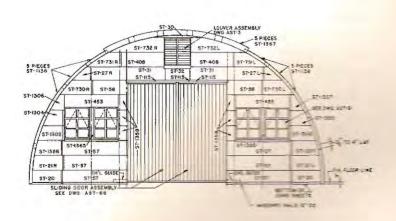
DETAIL SHOWING BULKHEAD CORRUGATED SHEET LAP
